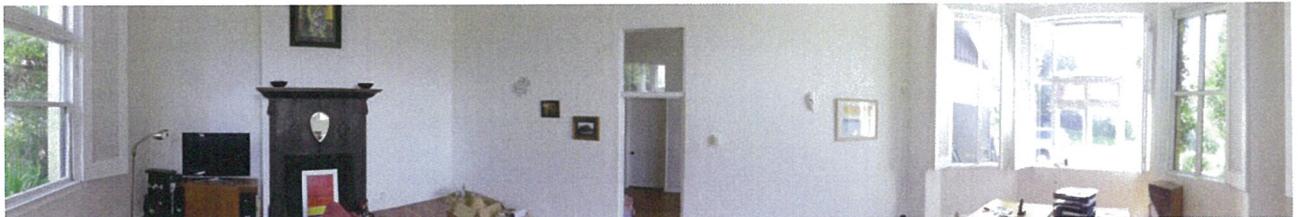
Panoramic photo of the south and west facing wall in the lounge.
